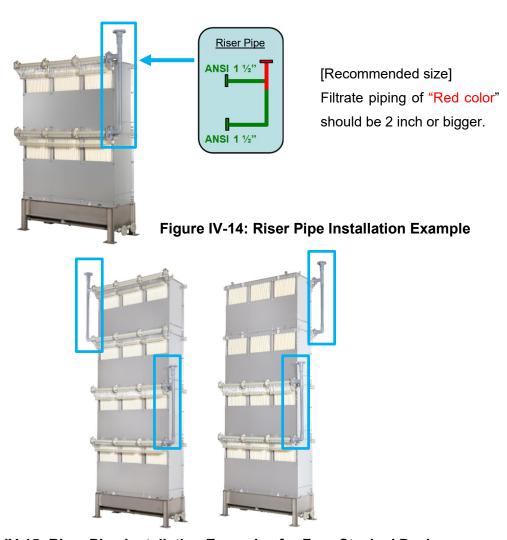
Riser Pipe Installation Examples for Four Stacked Decks
